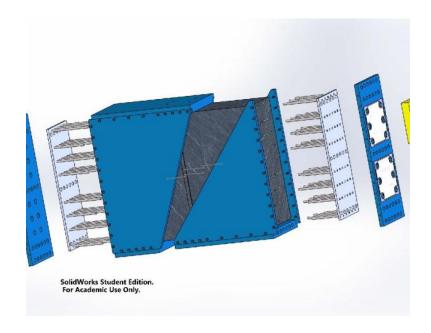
Exploded rendering of shear specimen with sample end plates and steel cage
